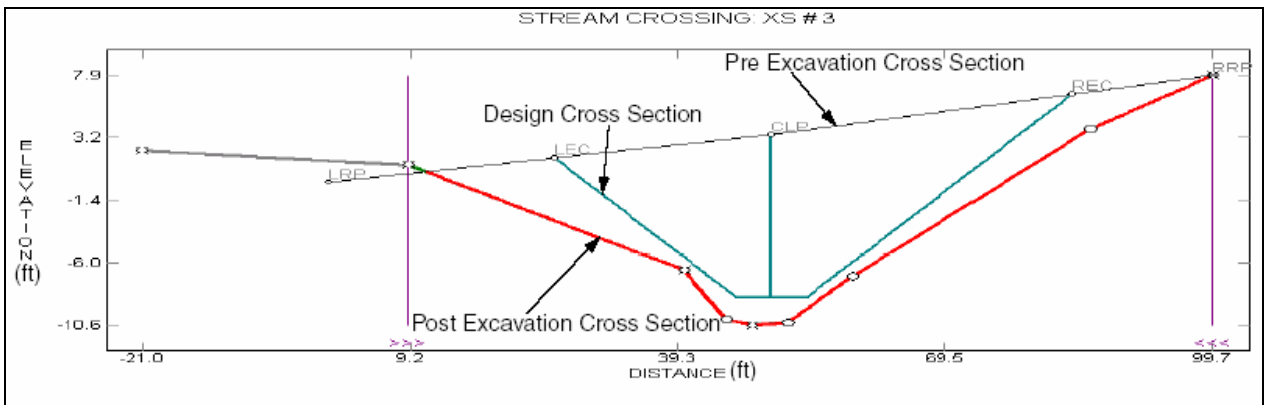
Redwood Creek 1300 Road Site #12 – Stream Crossing Pre & Post Excavation Profiles.
